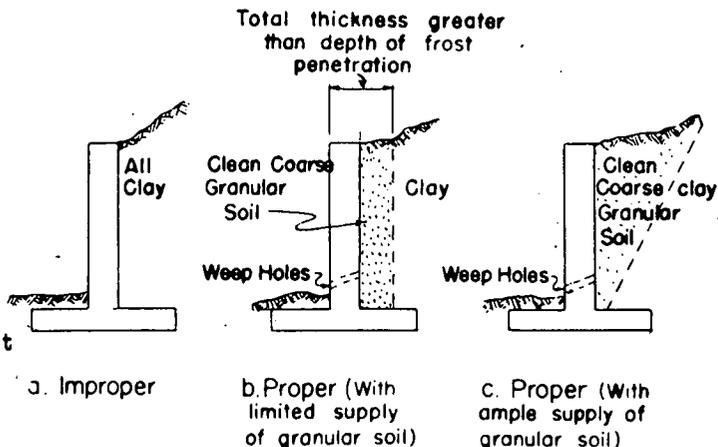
Backfilling around retaining Wall. (After AAF Manual)
